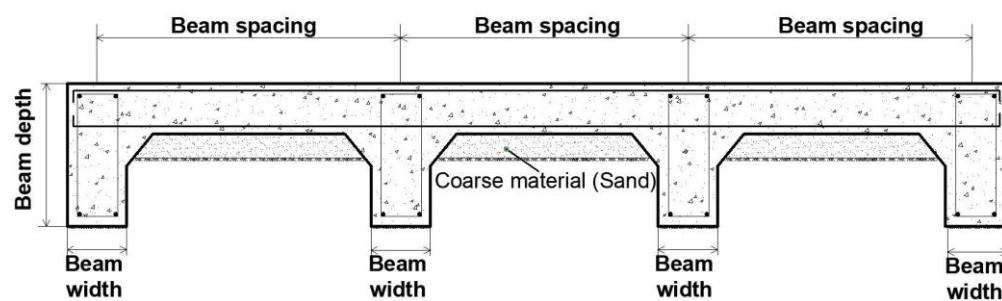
Pier, helical pile or granular anchor pile and beam foundations (compiled by the authors based on [59]).
